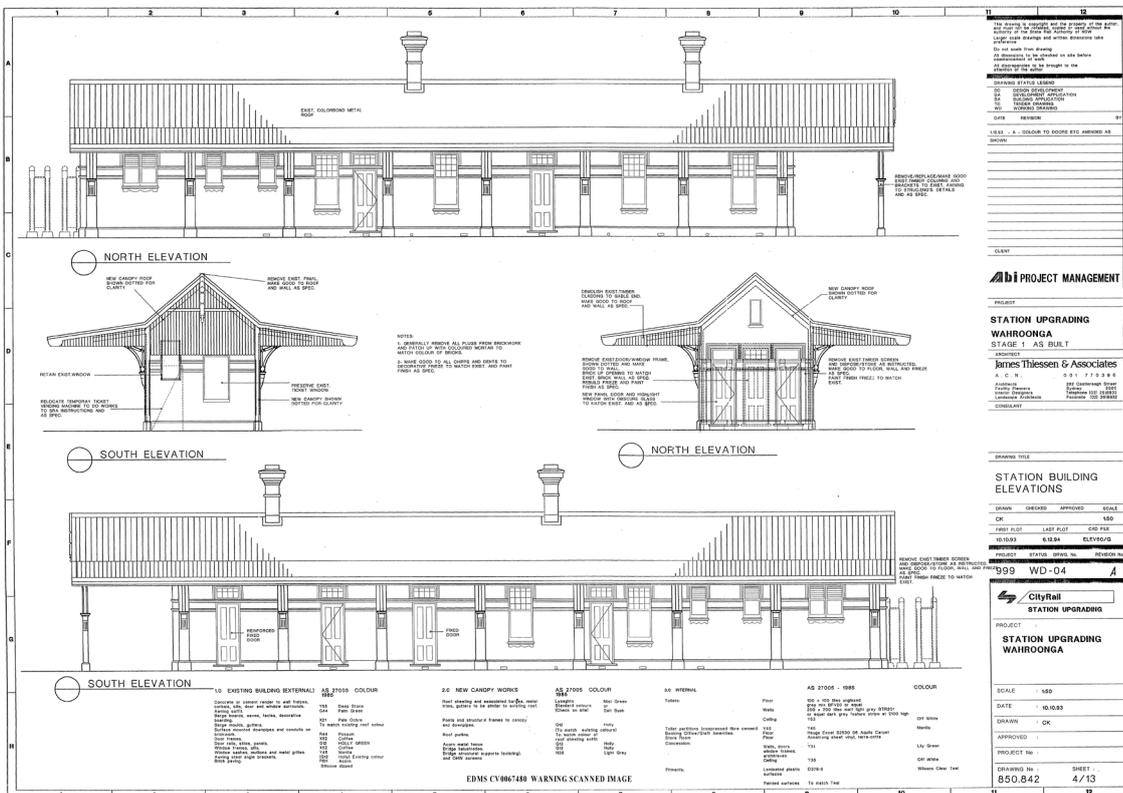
Station Building elevations 1994 (Source: Sydney Trains)
